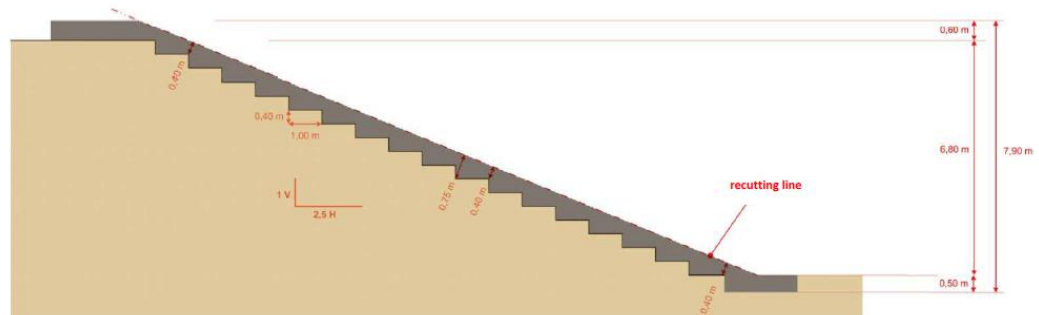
Construction methodology; stage 3: recutting of the embankment.
